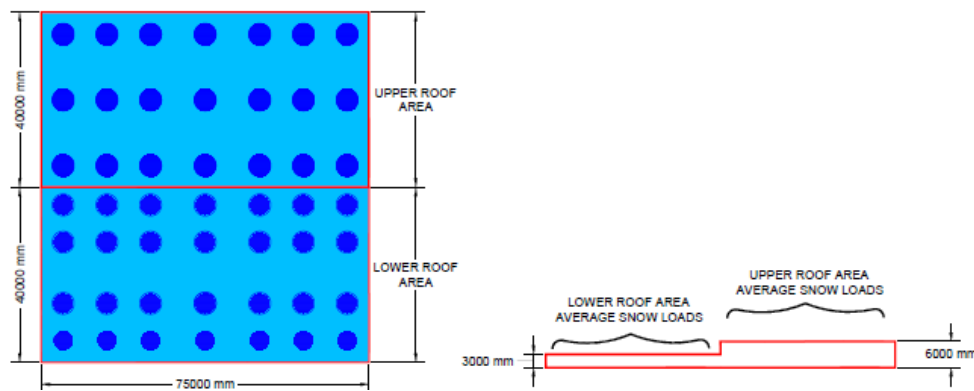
Plan and elevation views of the parametric model building. Dimensions are given in full-scale millimeters. Wind tunnel sensor locations indicated by the dark blue circles.
